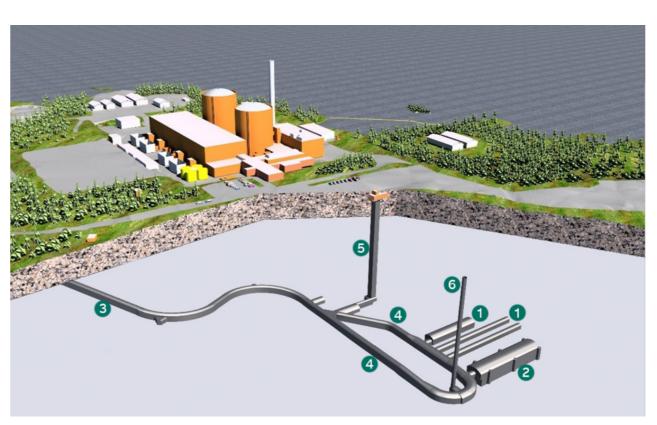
Loviisa power plant's final disposal facility for low- and intermediate-level waste (L/ILW repository) in its current size. Layout: Timo Kirkkomäki, Fortum.
